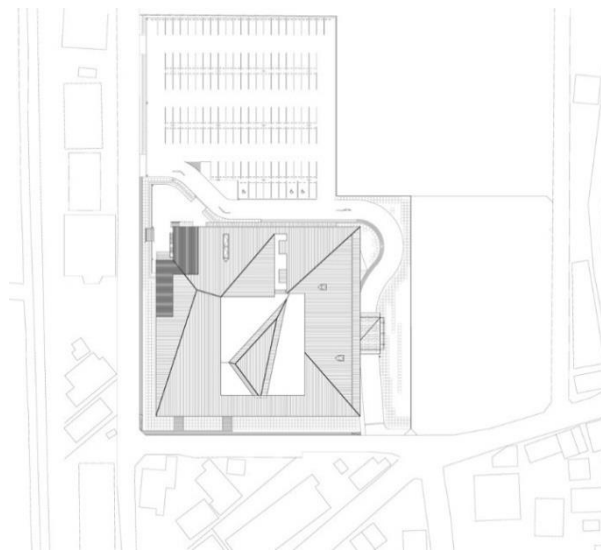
Site plan of Garden Terrace Miyazaki resort and hotel
